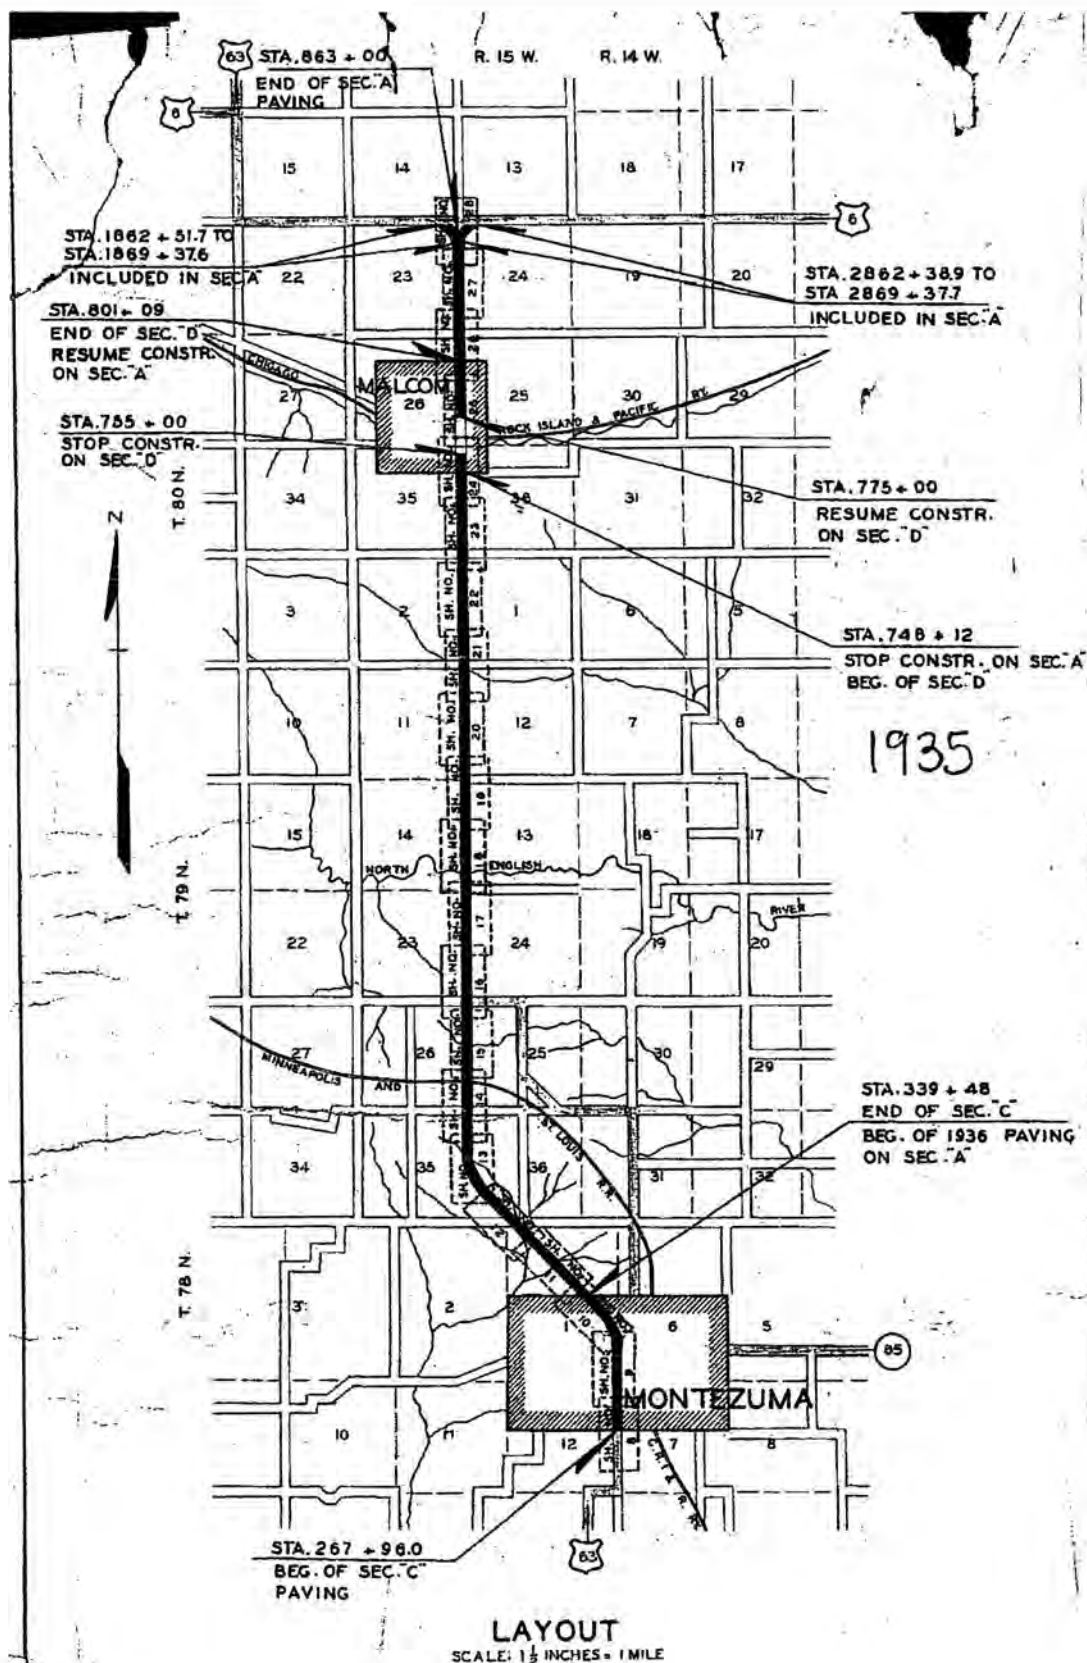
State Highway Commission map showing 1935 proposed improvements and rerouting of U.S. Highway 63 through Montezuma, constructed in 1936-38.
